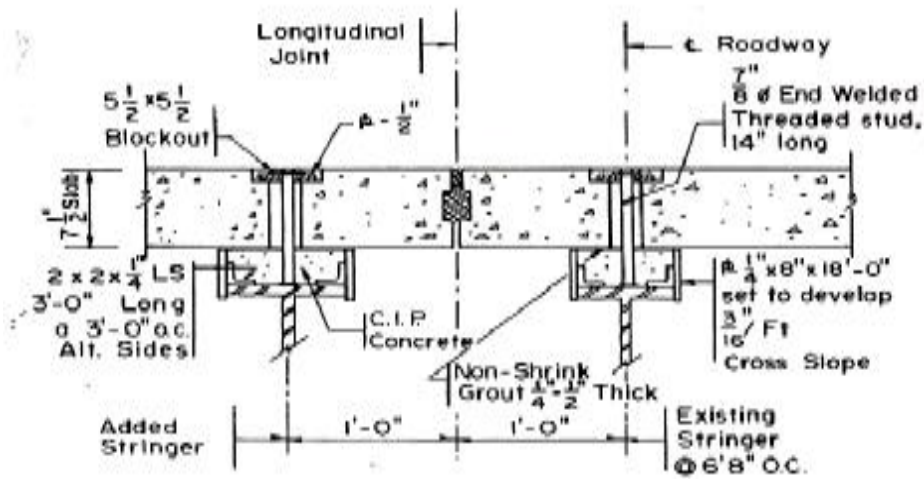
Connection details of the Southwestern Blvd. Bridge over Cattaraugus Creek
